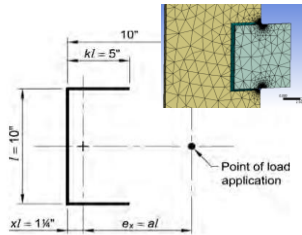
Weld geometry—Solution A ($\theta = 0^\circ$).
